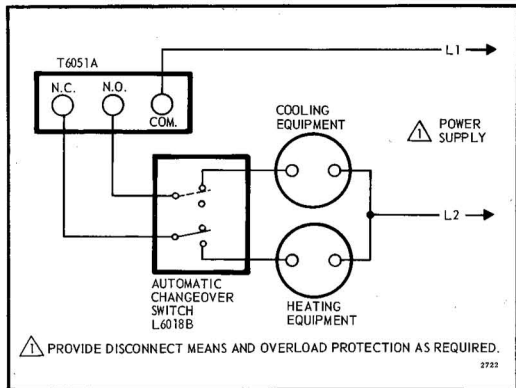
T6051A heating-cooling control for separate heating and cooling equipment.
